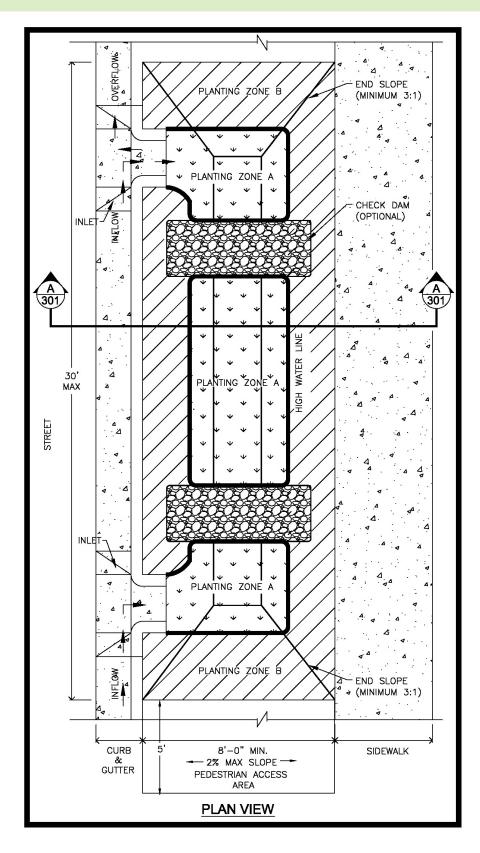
Green Streets Swale Plan View (source: Portland, 2011)
